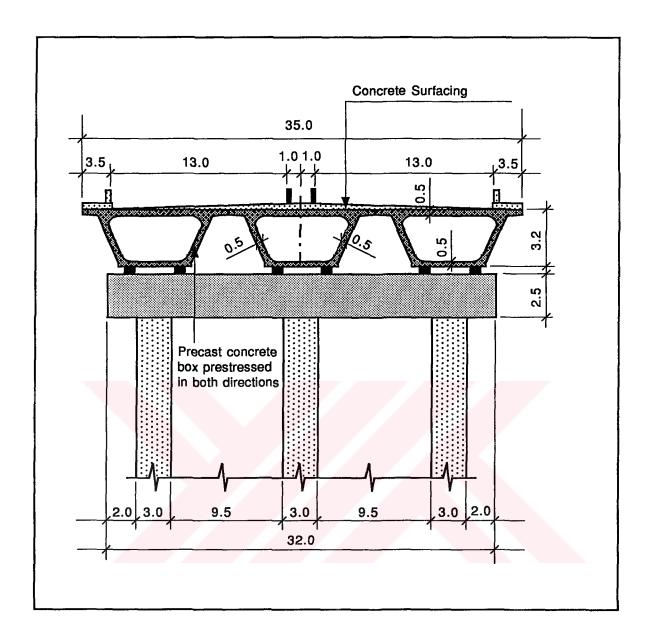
CROSS SECTION, APPROACH SPANS (in meters)
